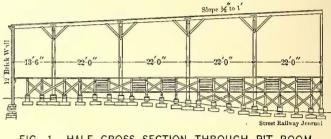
HALF CROSS SECTION THROUGH PIT ROOM.
